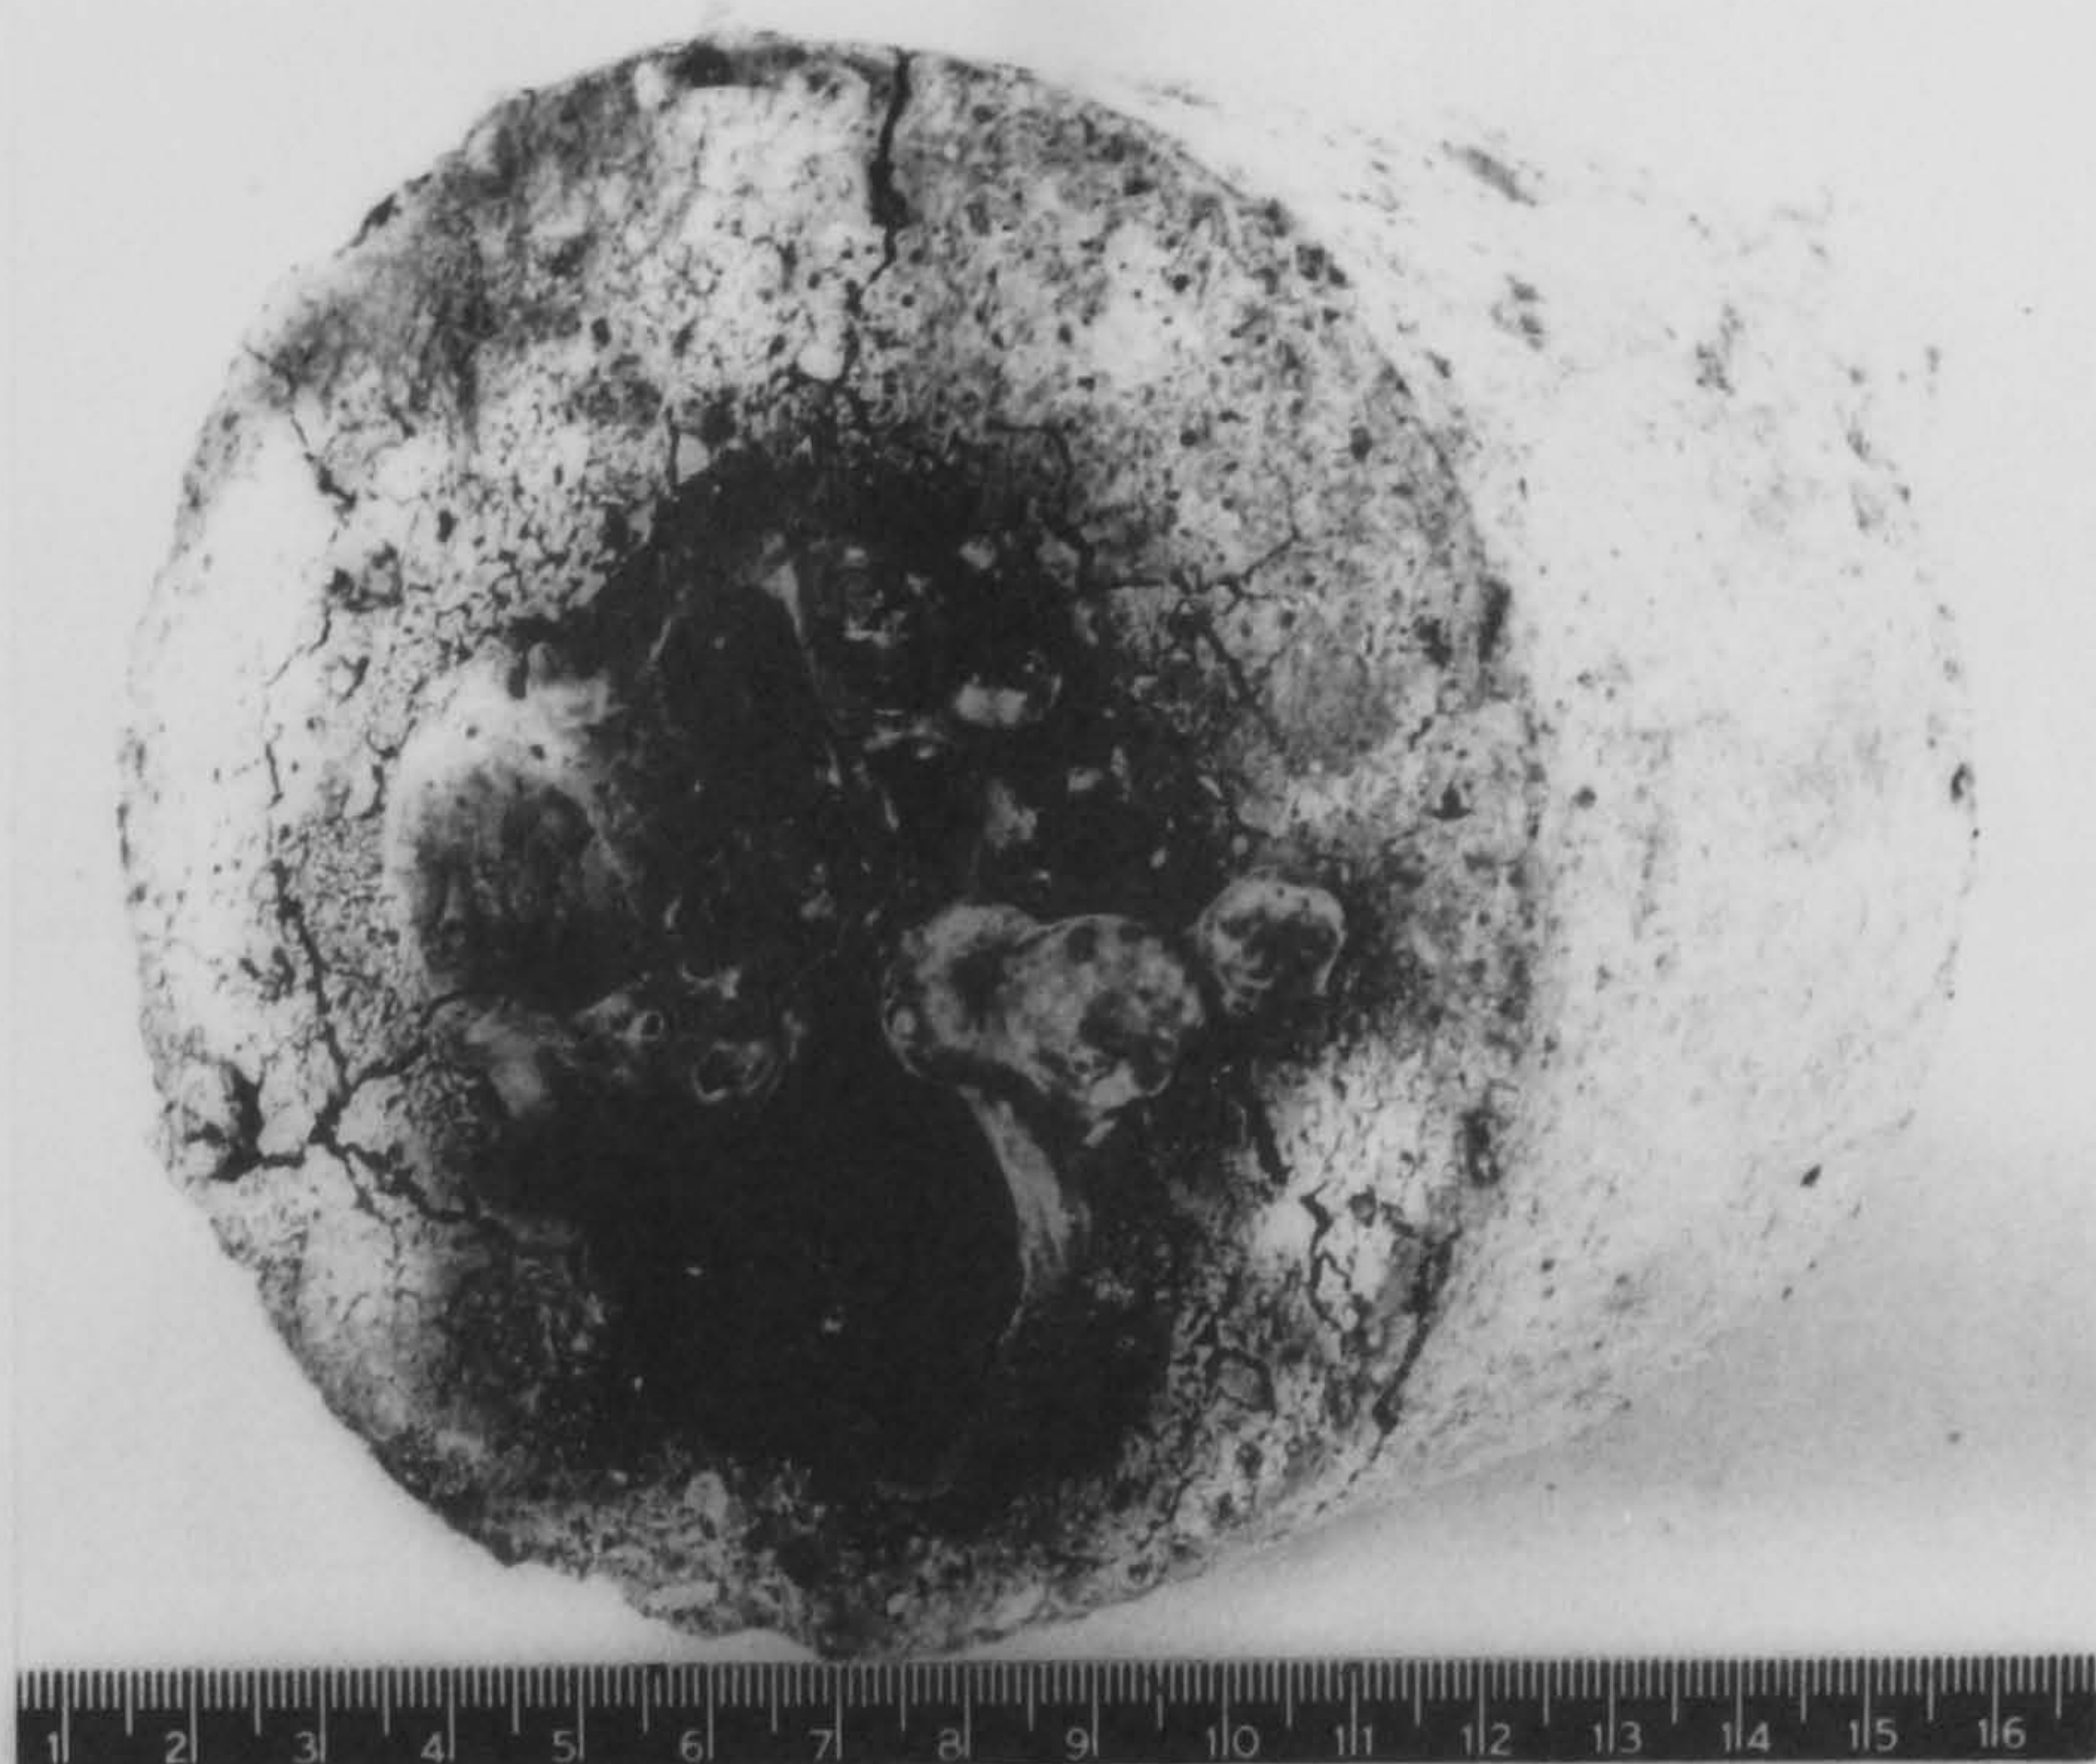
35 CROSS SECTION OF A 25mm SPECIMEN AFTER TEST
